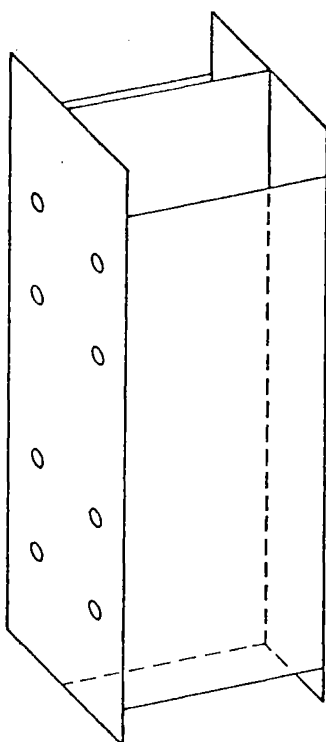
Column flanges stiffened by the doubler plate welded to the column flange tips.
